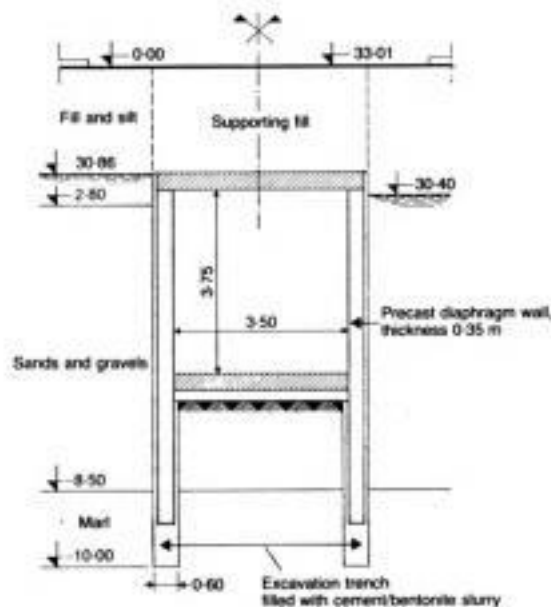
Vitny culvert: cross-section of completed works (courtesy of Bachy)
